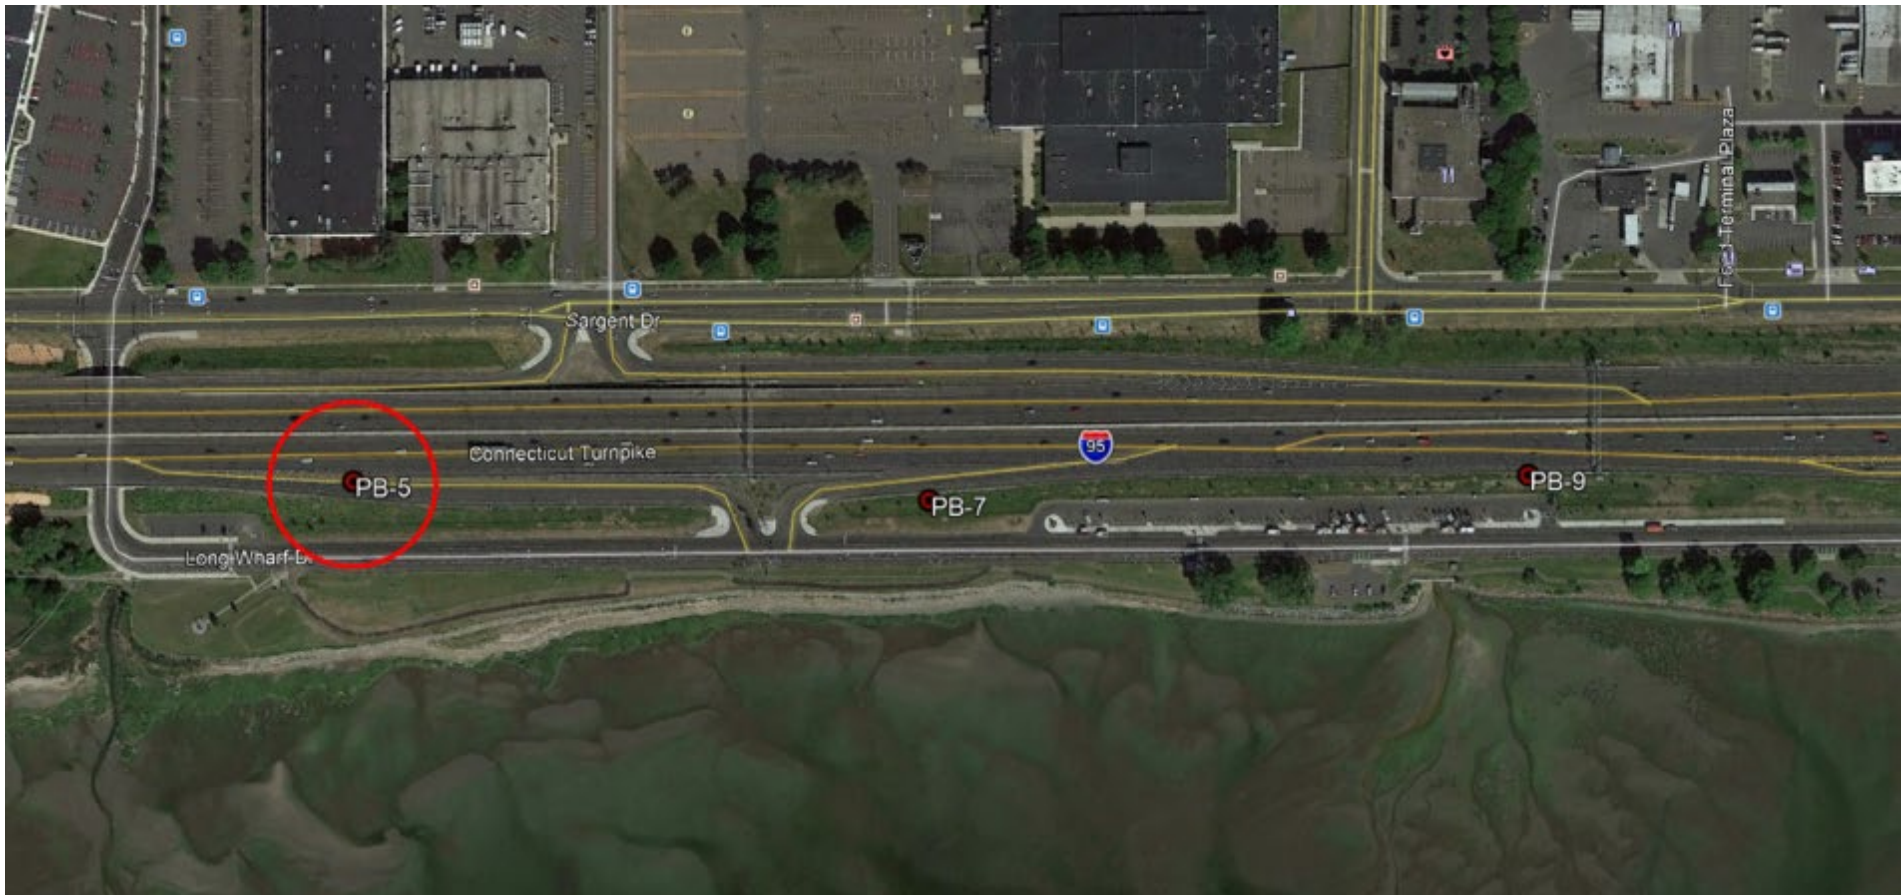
Location of boring PB-5 through embankment (others shown are at toe of embankment)
